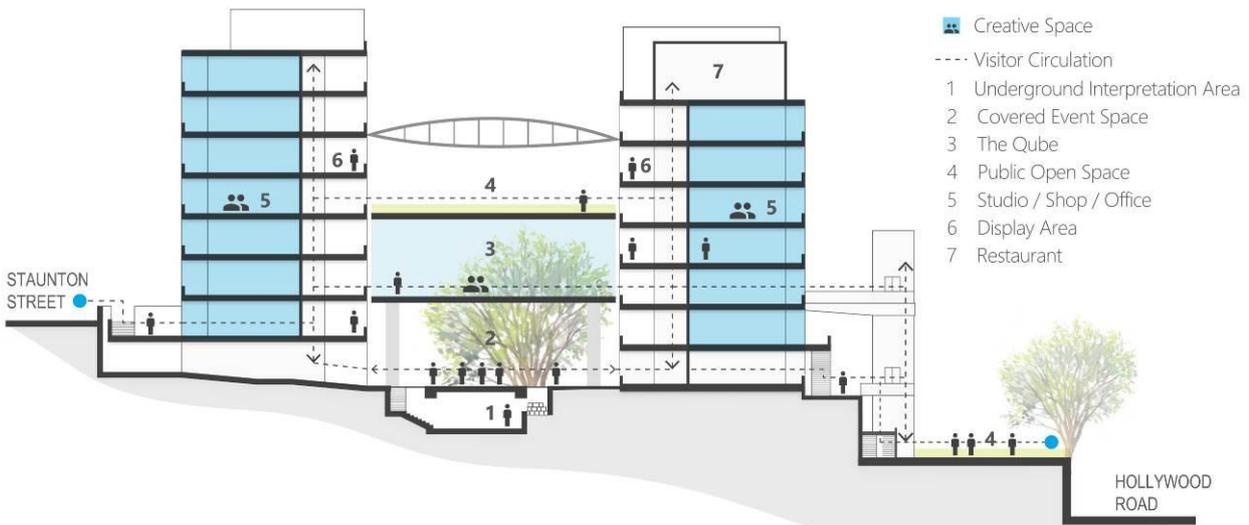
Section showing the step-down arrangement from Staunton Street to Hollywood Road
